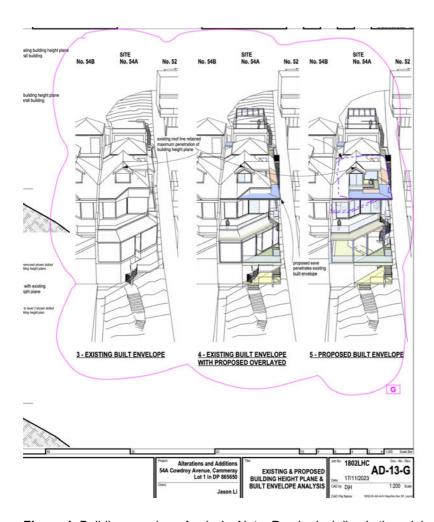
Building envelope Analysis. Note: Purple dash line is the original proposal submitted but since amended to respond to Council's concerns.
